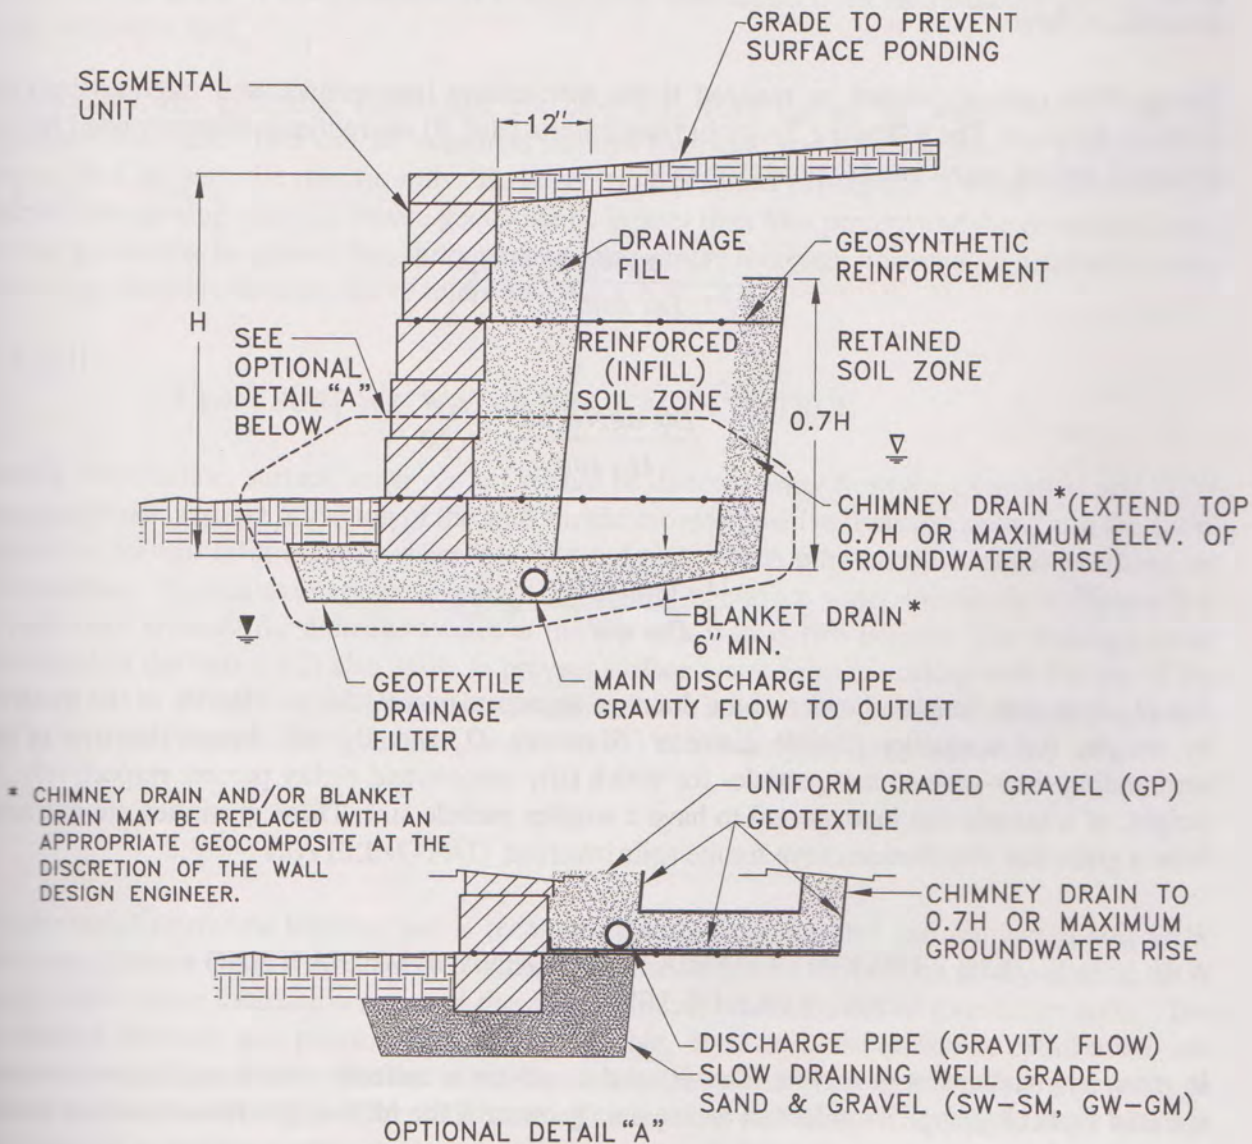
COMPLETE DRAINAGE SYSTEM - CASE 3
